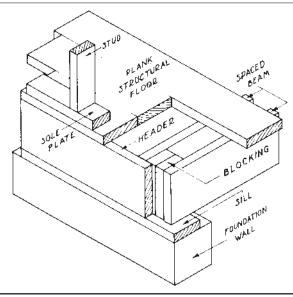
First Floor Framing at Exterior Wall With Beam Set in Foundation Wall
